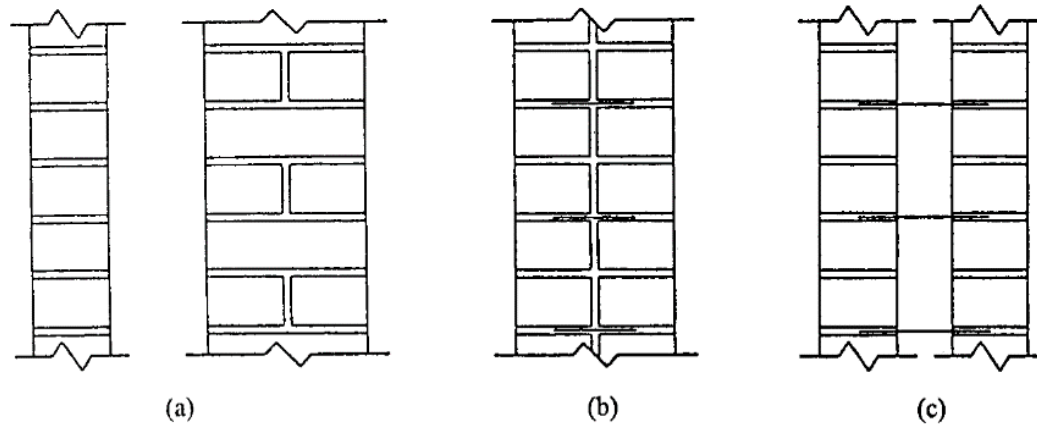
Cross-section of a (a) single-leaf, (b) double-leaf and (c) cavity wall (EC6).
